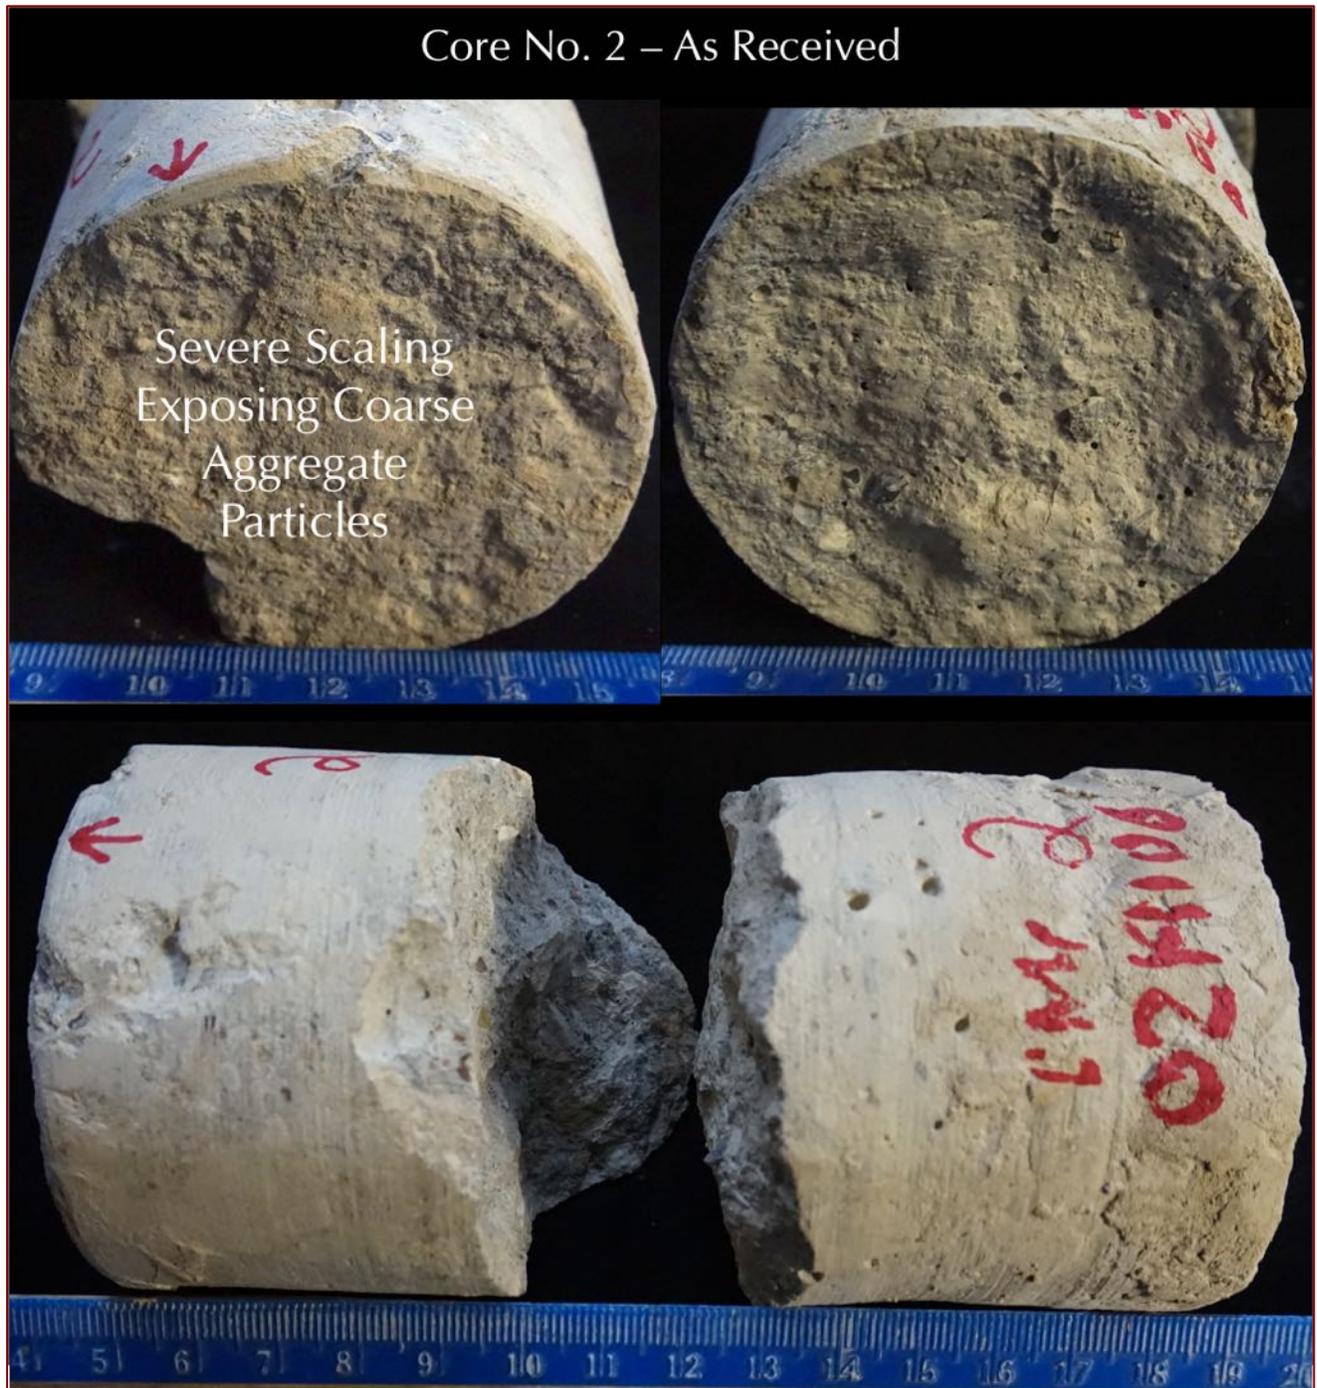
Photographs of Core 2 as received – Top left – Exposed surface with severe scaling and complete loss of the finished surface with exposed coarse and fine aggregate particles and a thin coating of drilling mud with fine hair-like mud cracks covering almost 50 percent of the scaled top; Top right – smooth formed wavy bottom surface with a thin layer of fine subbase, and bottom row - cylindrical side view of the core with identification showing a crack at the mid-depth location probably formed during the coring operation.
